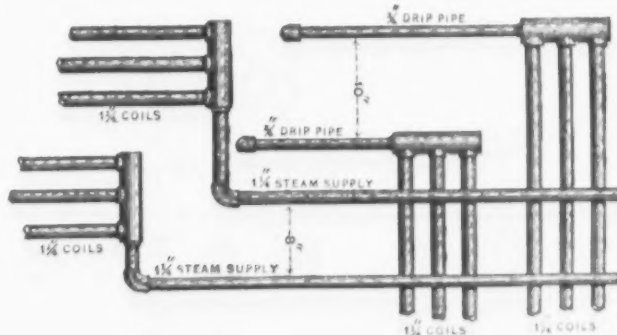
Plan of Connection at B, Stock and Packing Rooms, See Fig. 4.
